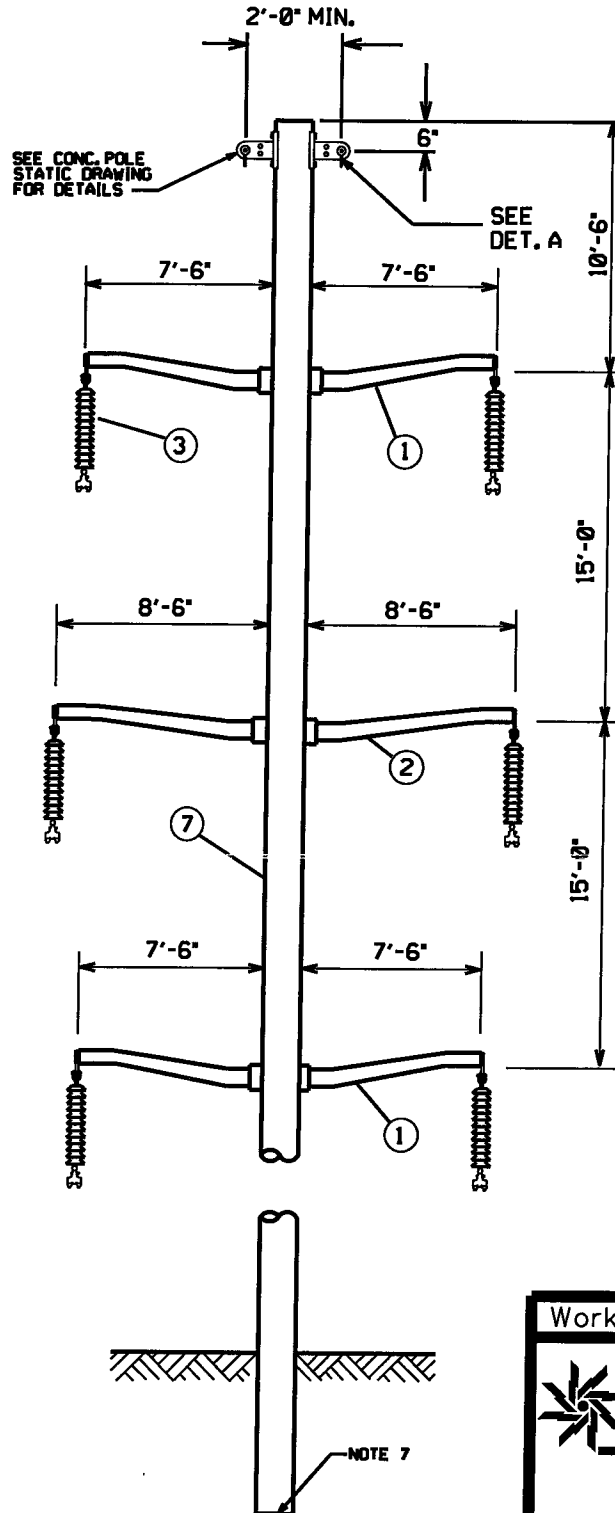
Dimensional Drawings of Typical Structures
